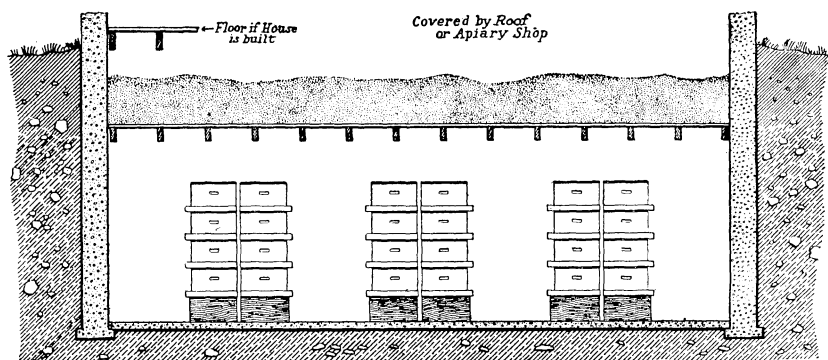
Diagram of bee cellar. Clearance 6 1/2 feet, ceiling 2 1/2 feet below ground level, packed with about 1 1/2 feet of sawdust.
